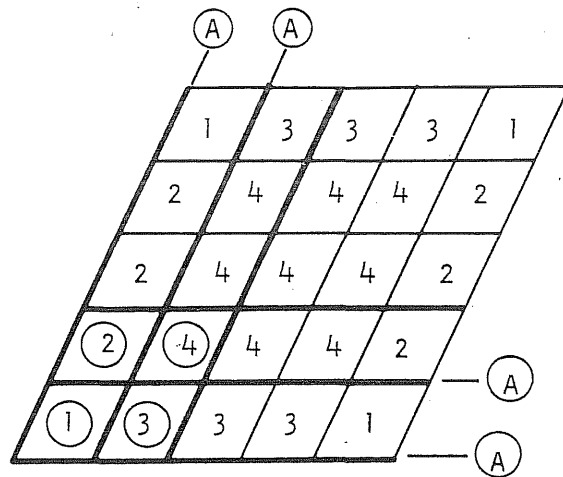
TYPICAL FLOOR SHOWING SLAB GROUPS
